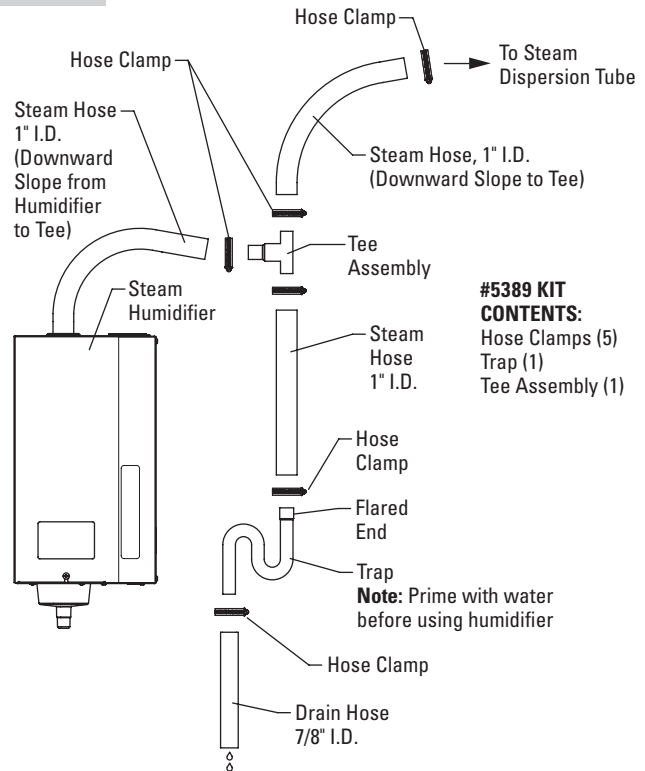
Dispersion Tube Mounted Below Humidifier
